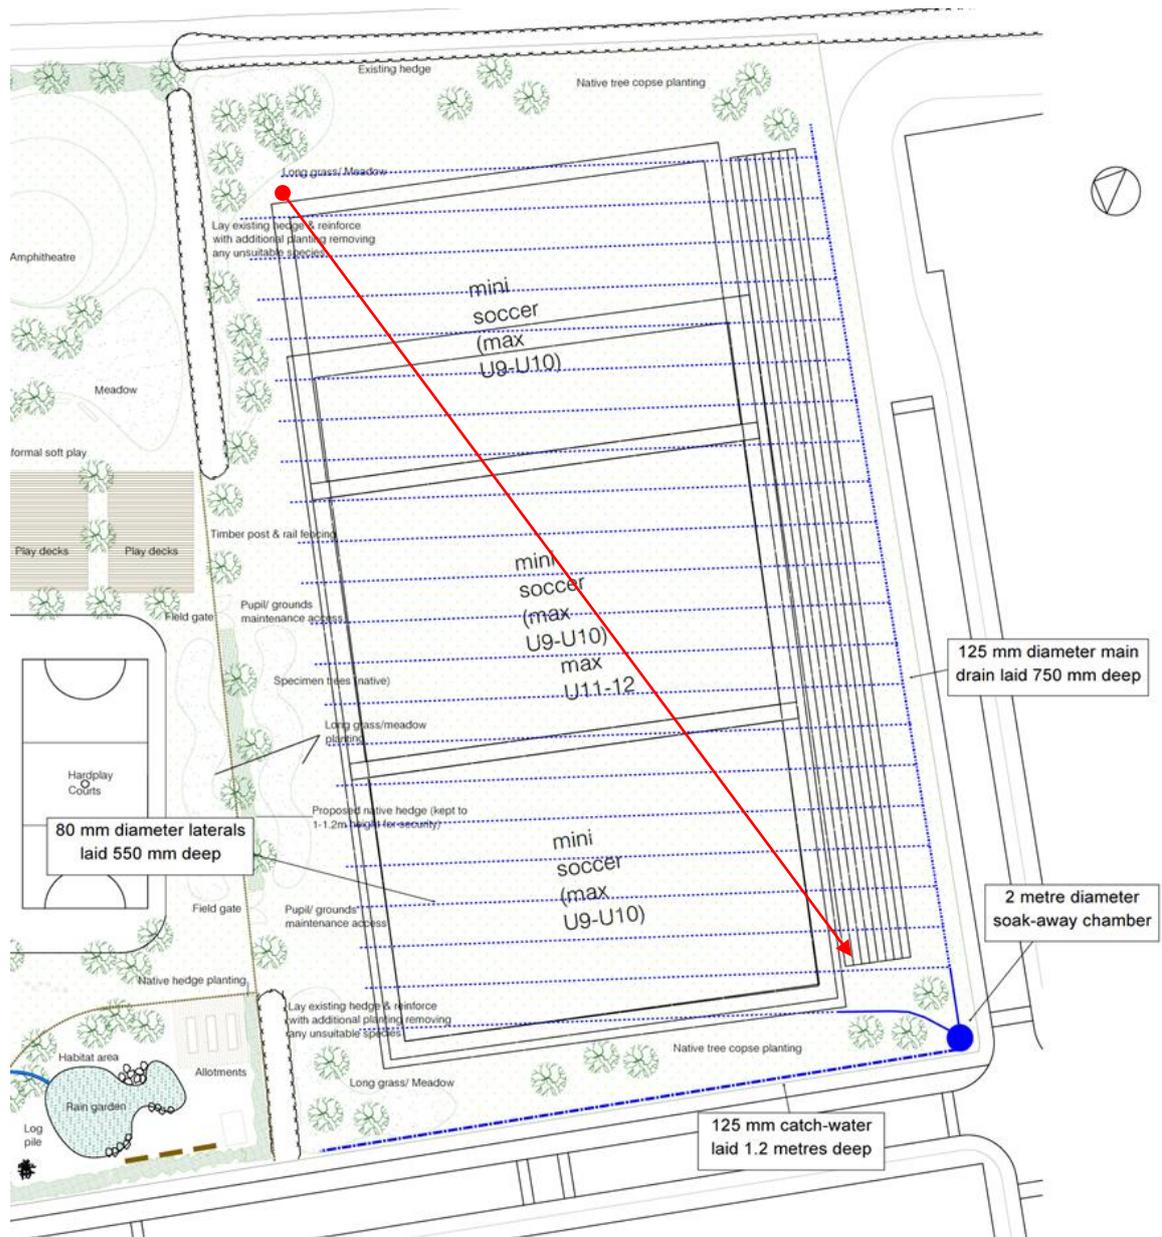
Proposed drainage layout, red arrow indicates direction of field slope after laser grading
